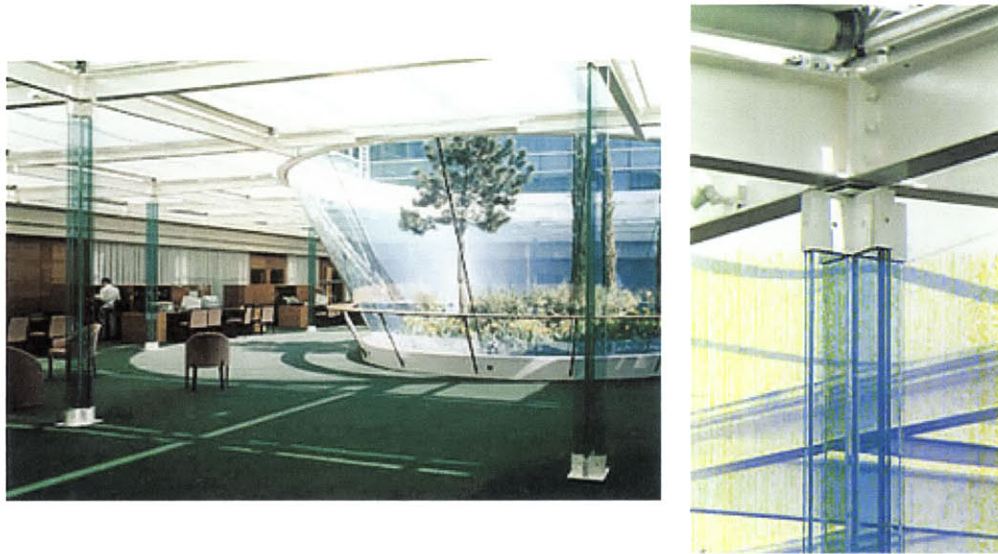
a) Glass columns in the town hall patio, b) Close up of load-bearing laminated glass column [37]
